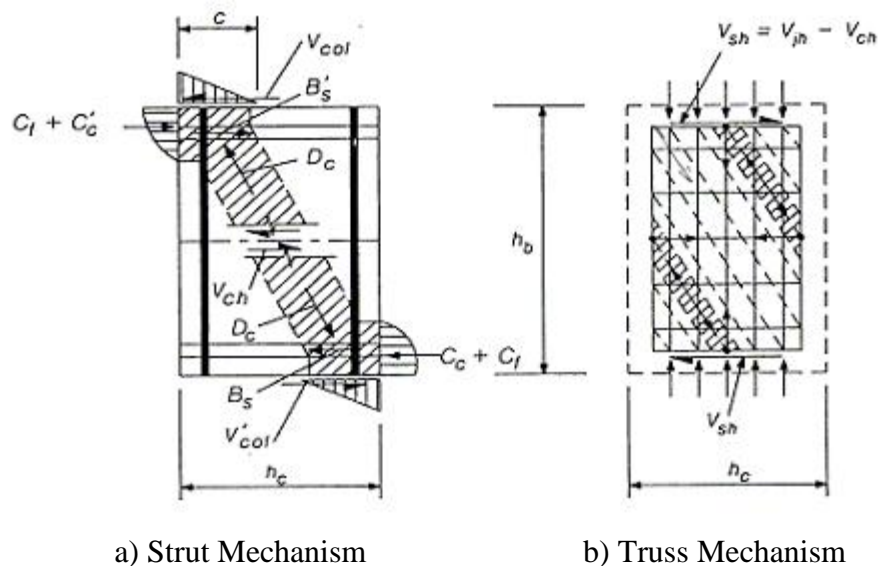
Forces and Detailing Requirement for Exterior Joint
